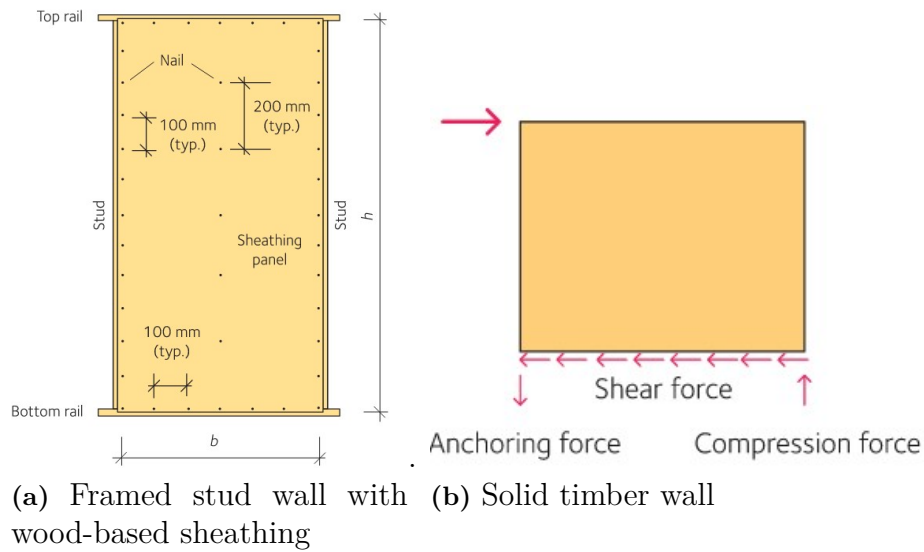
Two types of shear walls in timber structures. Copyright 2022 by Swedish Wood.
